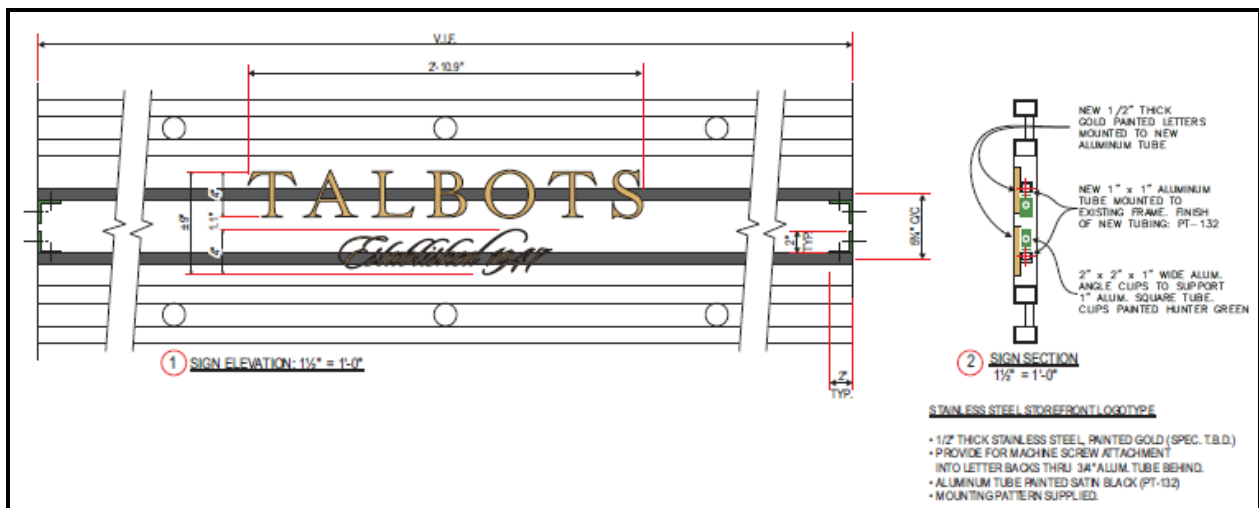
Sign Section for Signage to be Mounted on New Aluminum Tubes on the Existing Sign Frame
